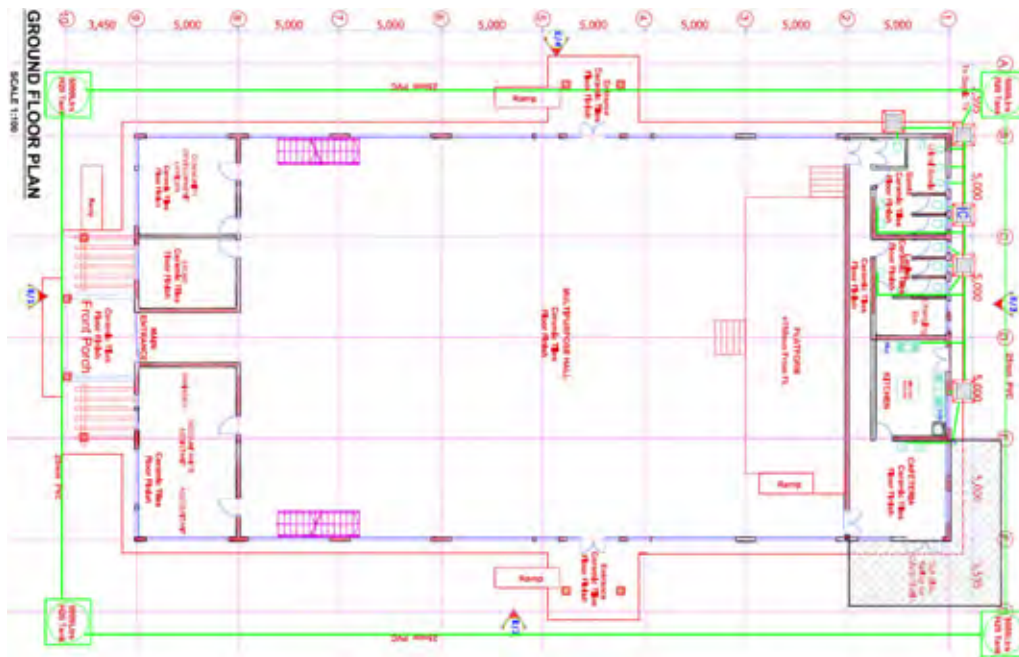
Ground Floor Plan of the Multi-purpose Hall
